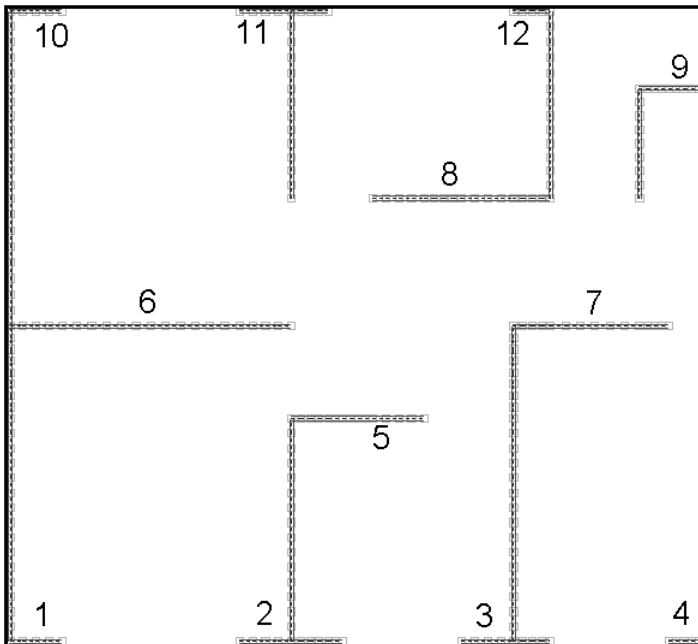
Plan of the Apartment-House 1 (AH1) with the numeration of the shear-walls
